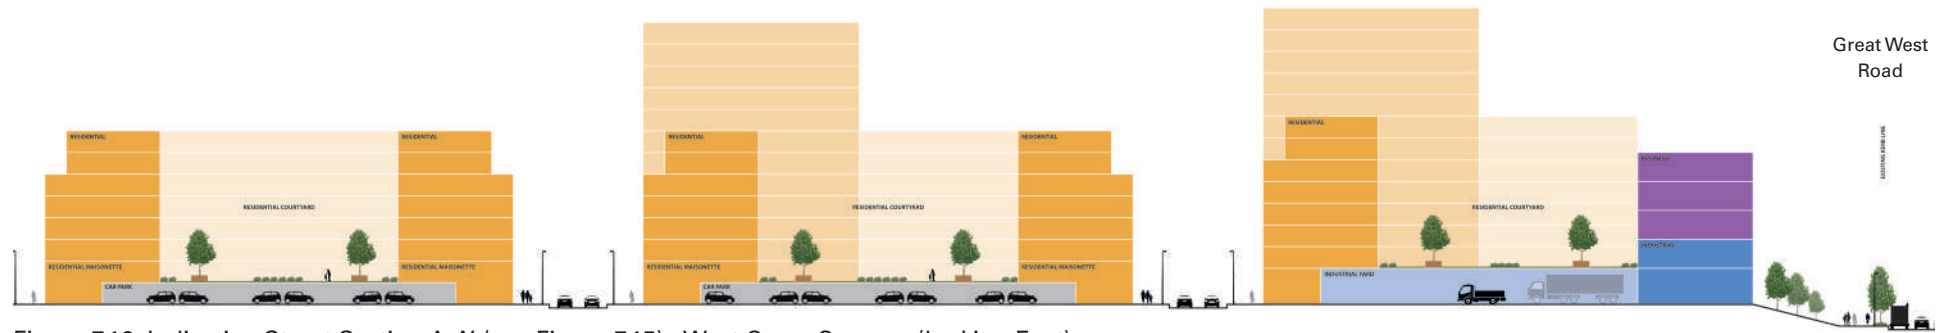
Indicative Street Section A-A' (see Figure 7.15) - West Cross Campus (looking East)
